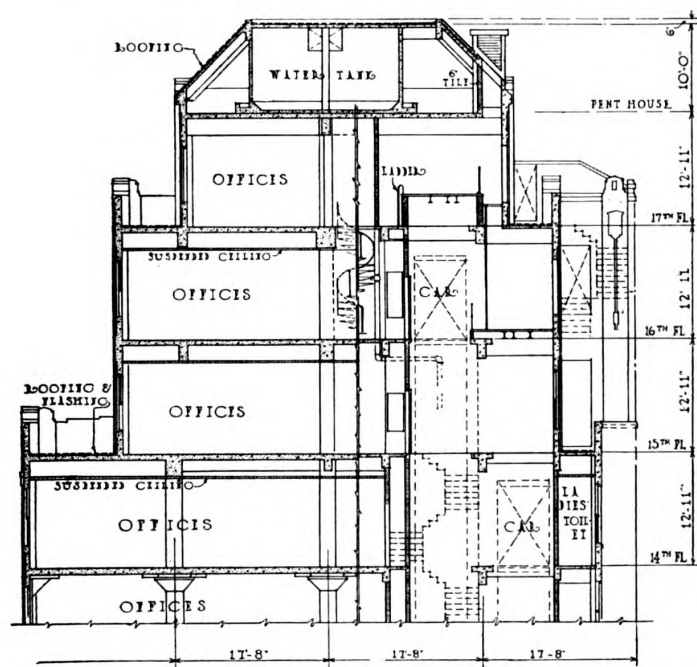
Section through Upper Stories Showing Concrete Water Tank and Portion of Load Carried on 15th Floor Slab
